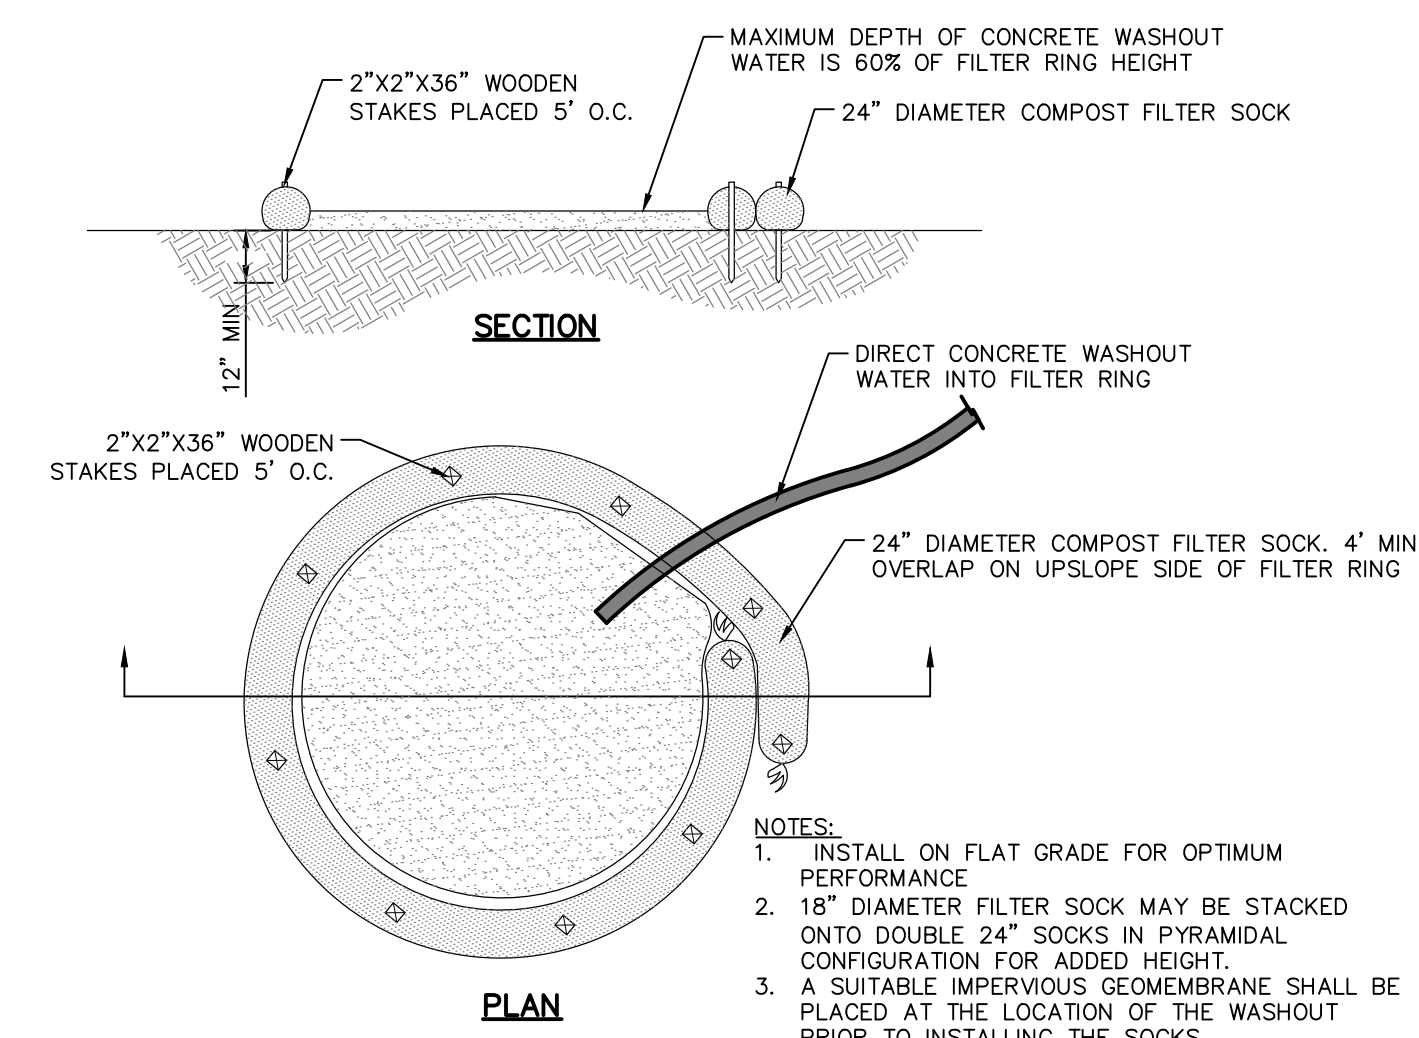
TYPICAL COMPOST SOCK WASHOUT INSTALLATION
